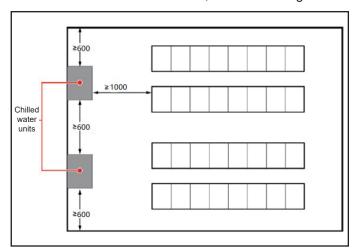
Diagram of Indoor Unit Installation Location (unit: mm)
